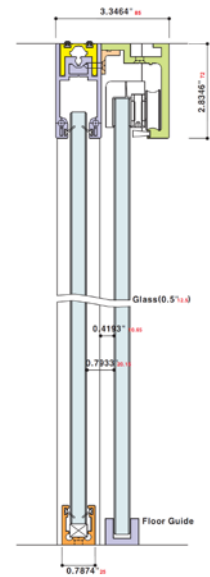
TYPICAL CROSS-SECTION OF SLIDING DOOR
